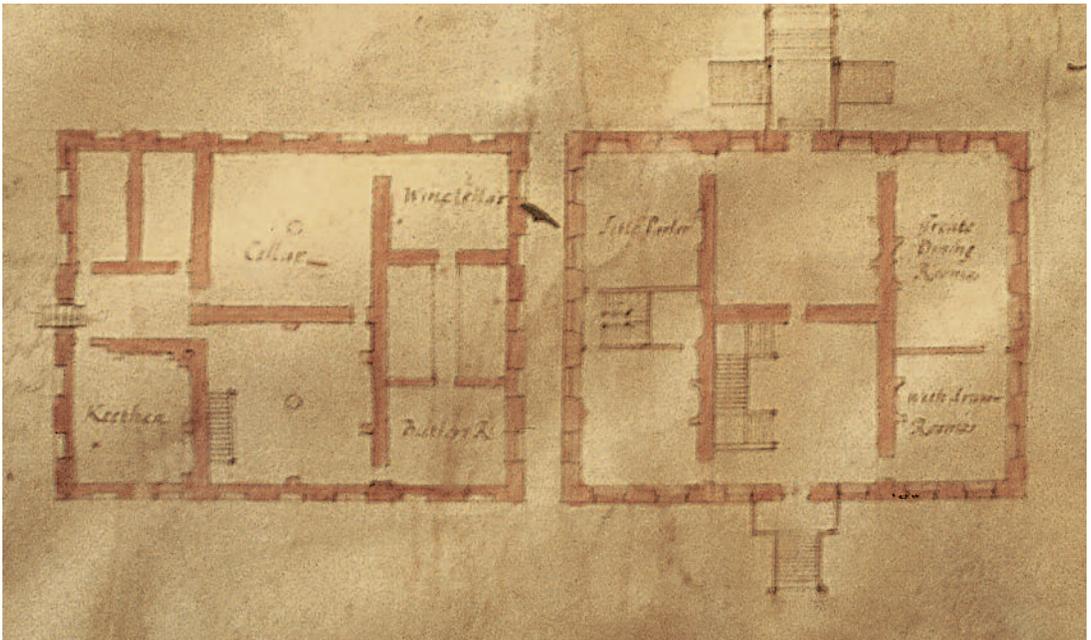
Chevening, basement and ground-floor plans, 1679. *Chevening Estate*.
